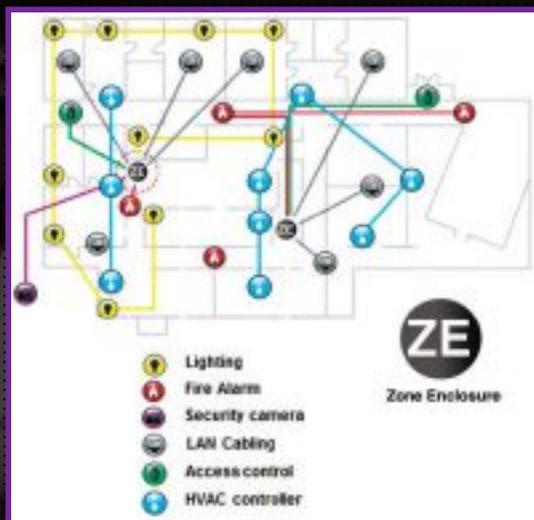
Example zone cabling layout serving voice, data, and BAS applications
